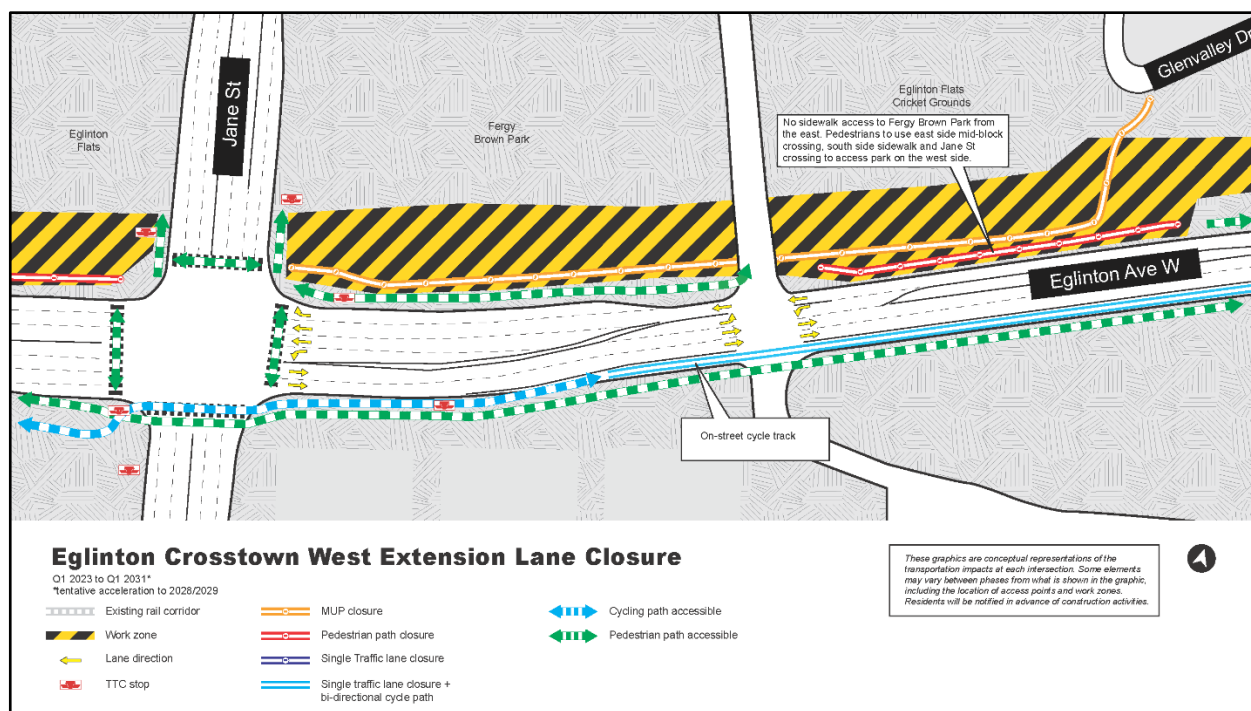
ECWE Elevated Guideway, Launch Site and Jane Tunnel Portal Work Sites
